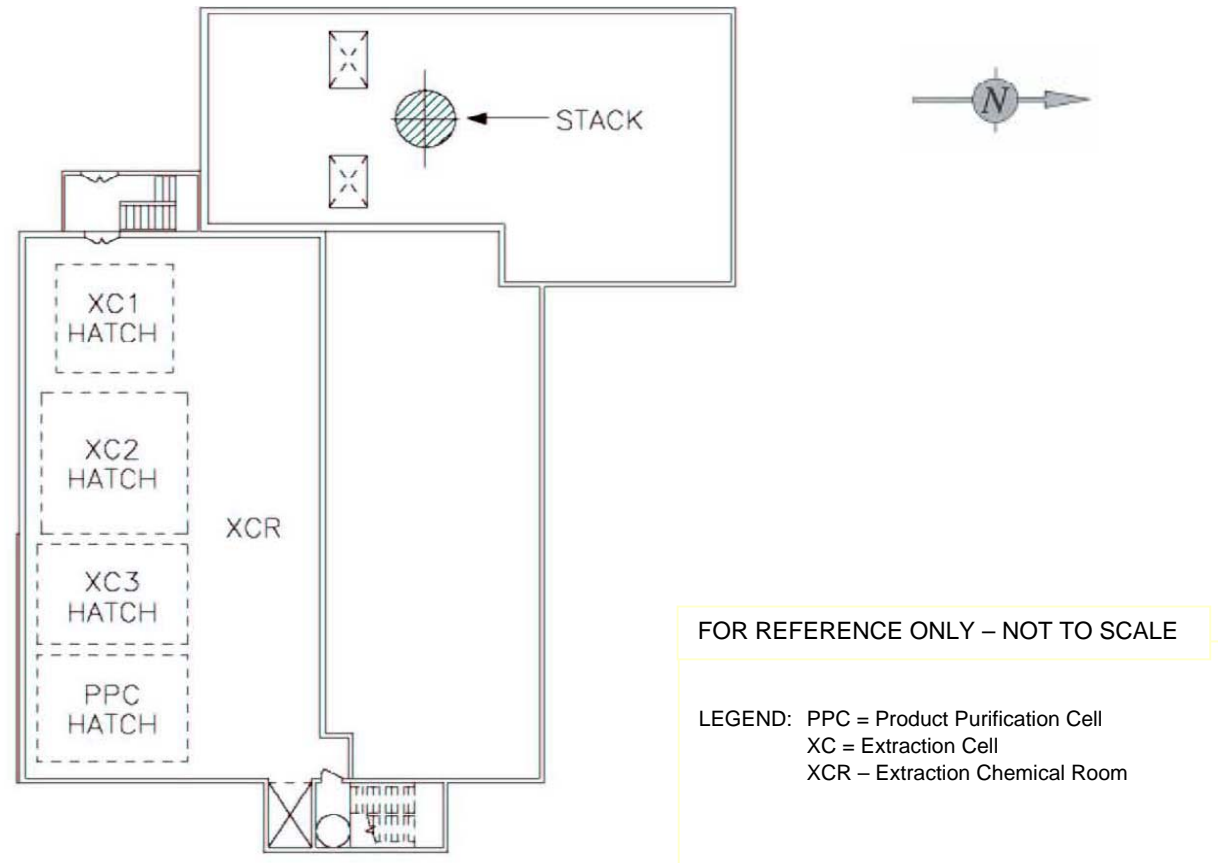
F. Process Building Layout at 160-Foot Elevation
